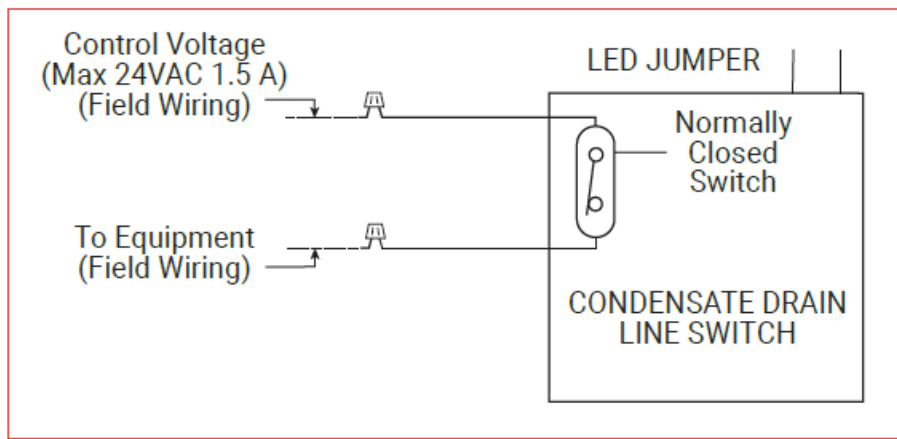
FIG. E: WIRING DIAGRAM WITH CUT JUMPER WIRE
